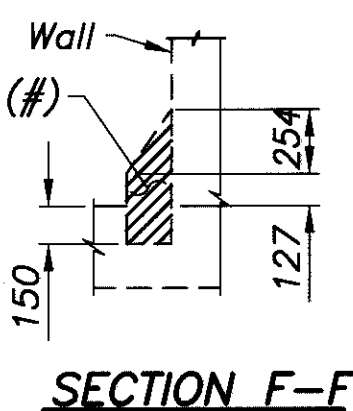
DETAILS FOR PARAPET REPLACEMENT AT ABUTMENT DECK JOINTS
